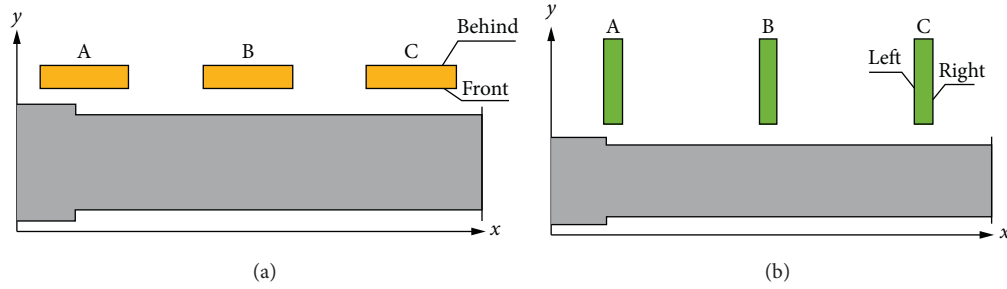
The position relationship between the foundation pit and building, as viewed from above, in plane coordinate and building number.
